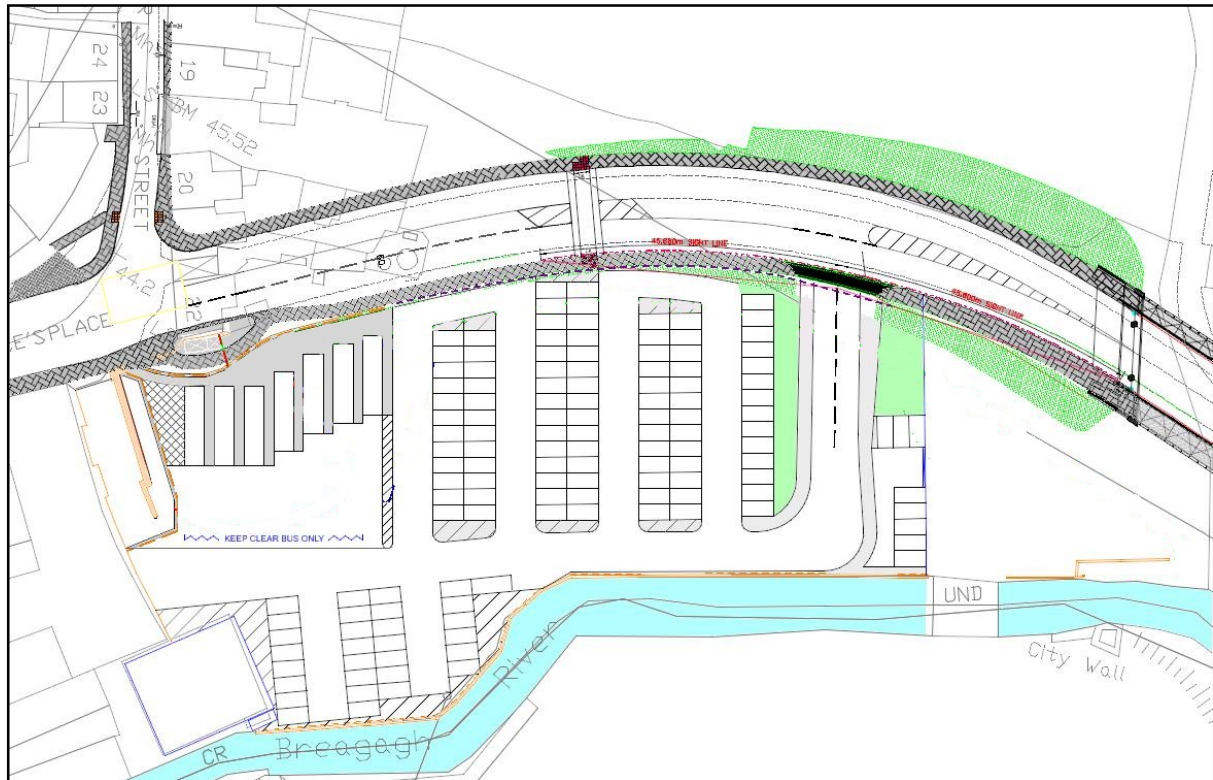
LAYOUT OF PROPOSED CAR/COACH PARK
